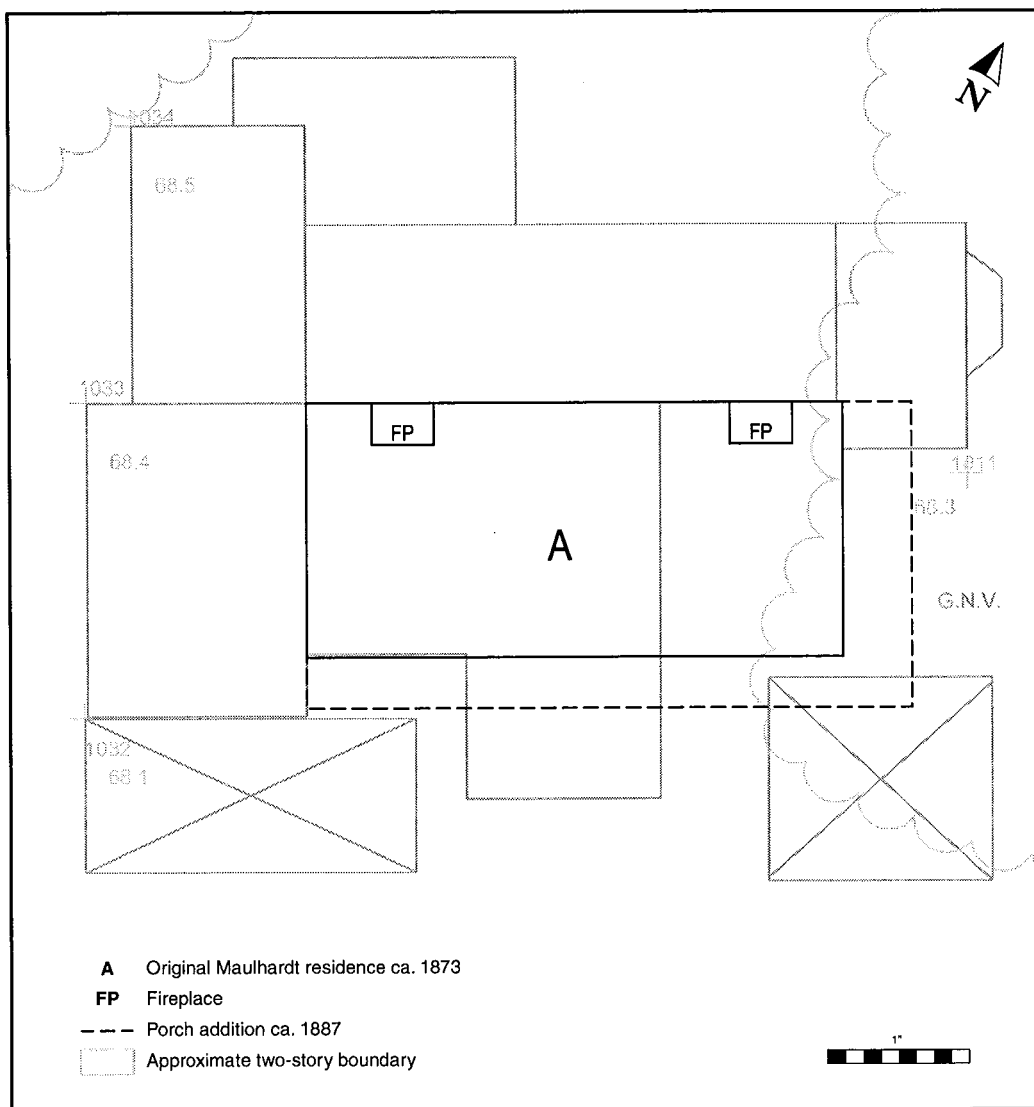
Plan of the original Maulhardt residence, ca. 1873, showing the 1887 porch addition.
